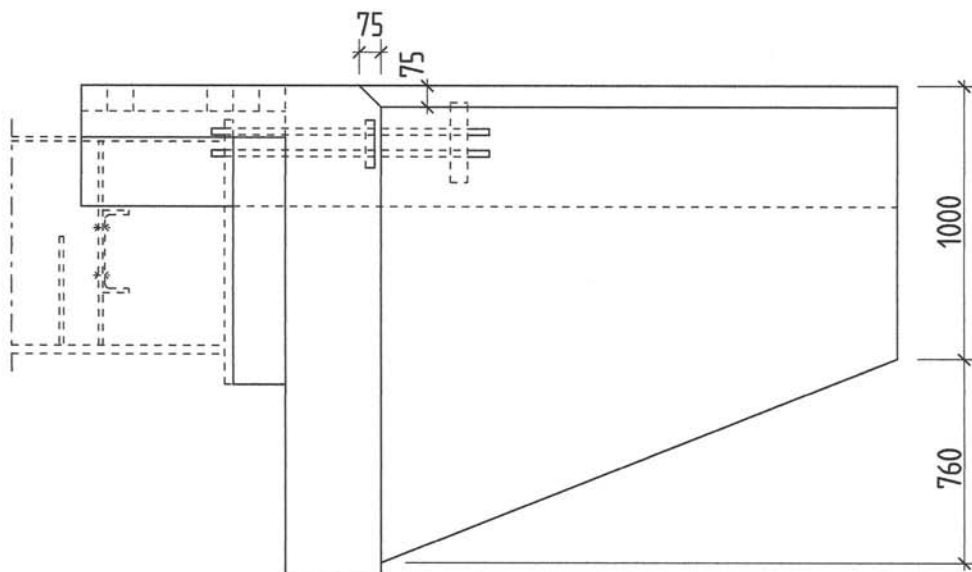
Prefabricated back-wall with side-wings, used for a composite bridge.
